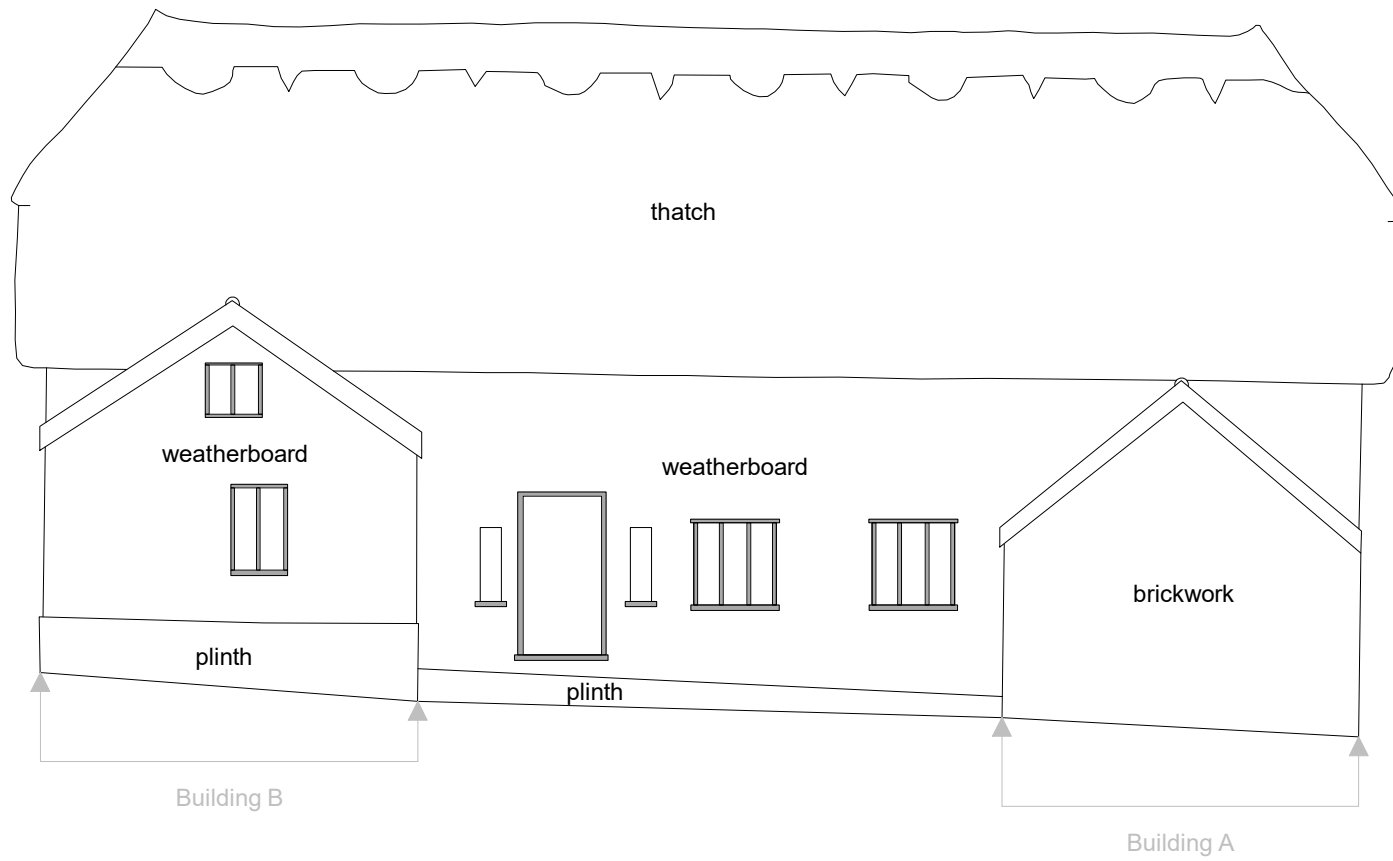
Northern elevation of barn and Buildings A and B. Modern additions shown in grey.
